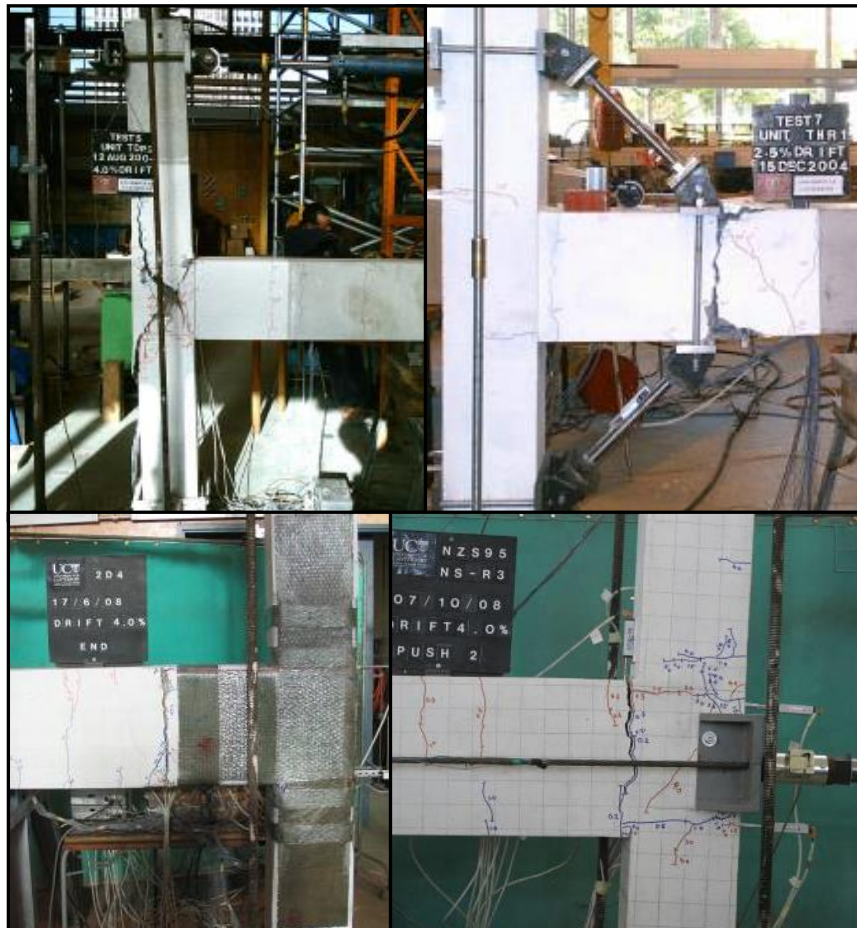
Top left: as-built specimen; top right: metallic haunch, bottom left: GFRP layers; bottom right: selective weakening and external post-tensioning.
